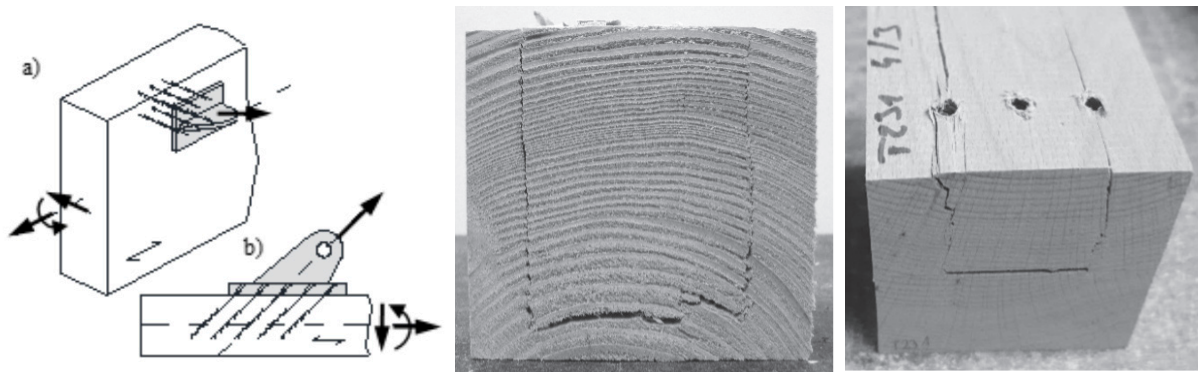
(left) examples for unilateral joints of primary axially-loaded screw groups with a risk for block shear failure mechanism: a) wind bracing joint on side-face and b) hanged beam; (middle); typical block shear failure pattern on a cross section cut in the middle of a screw joint, exemplarily for a group of 5 x 5 screws in Norway spruce and (right) for a group of 3 x 5 screws in birch.
